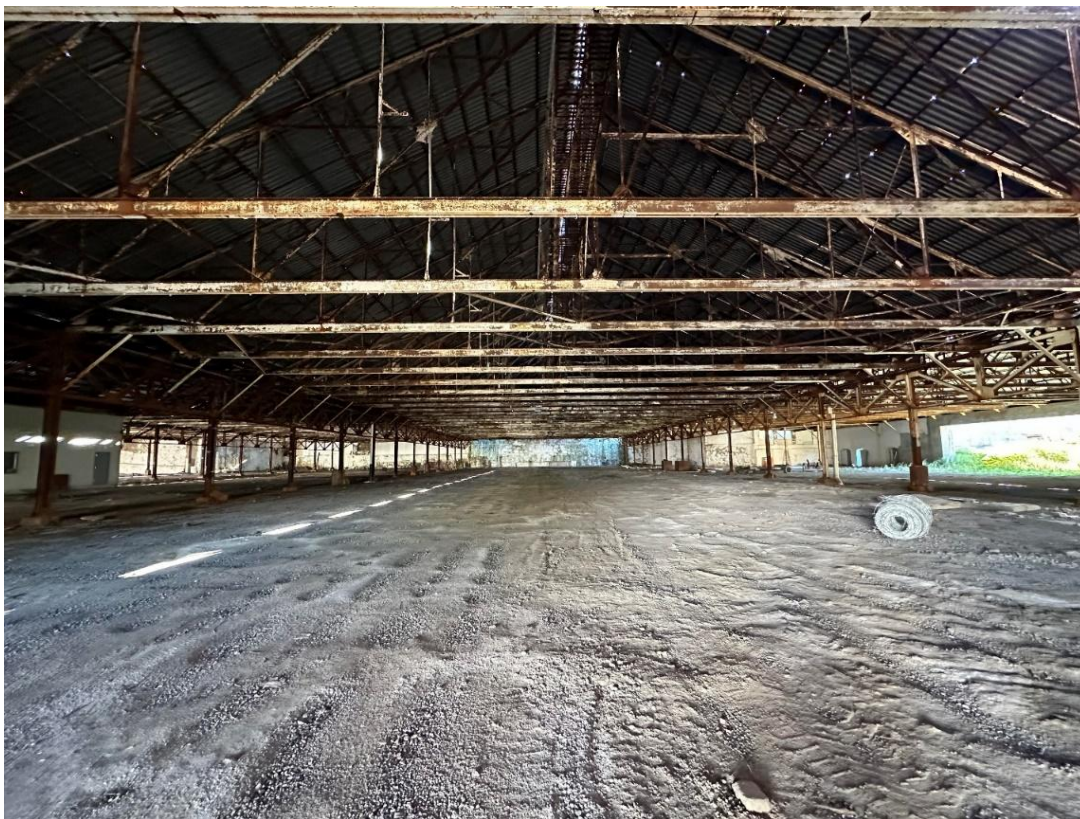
Interior of the Rolling Mill (building 34/223). Photo facing west.
